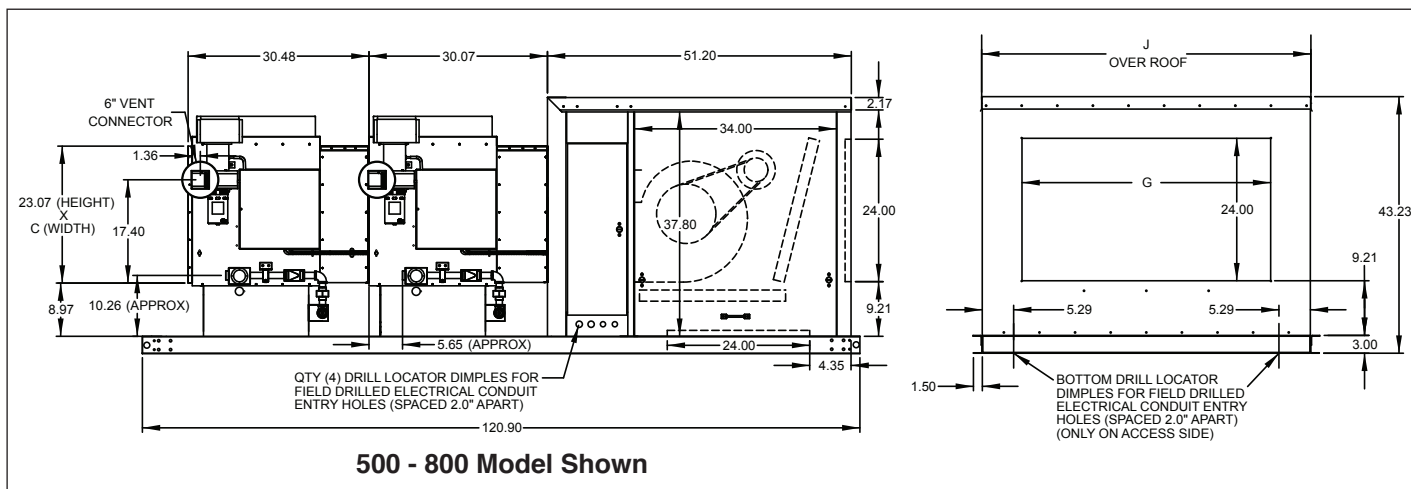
ICP Indoor Power Vented Cooling Package Unit Dimensions
